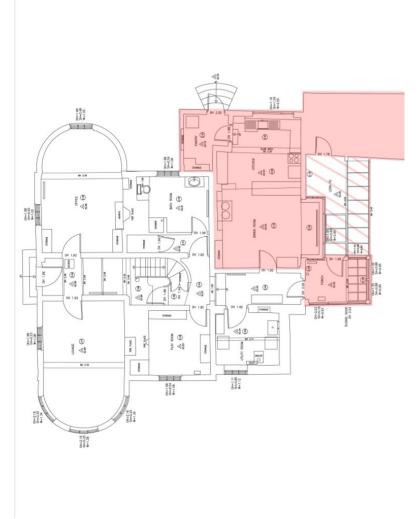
Plan showing existing house and the interior shaded red to be recorded.
